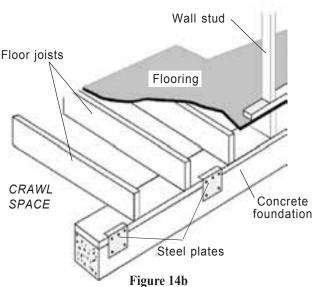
Anchor bolts or steel plates. A home's crawl space may be formed by a cripple wall (see next page for description) between the foundation and the floor joists or the floor joists may rest directly on the sill plate. In either case, you should be able to see the heads of anchor bolts or steel plates installed at appropriate intervals. These fixtures fasten the sill plate to the foundation.
